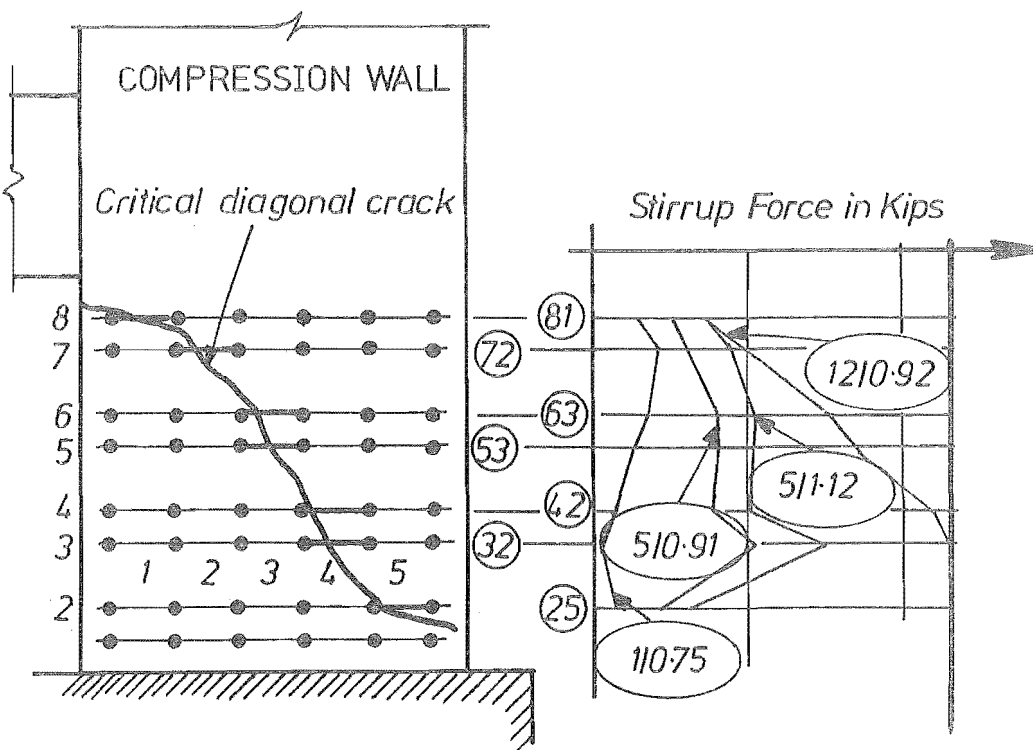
(b) STIRRUP FORCE VARIATION ACROSS THE POTENTIAL CRACK IN THE RIGHT WALL
